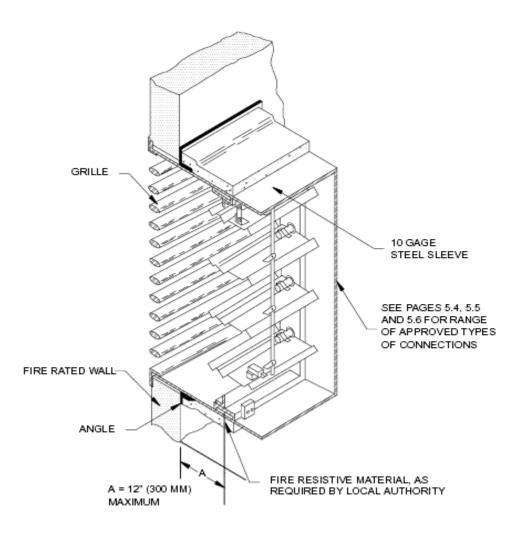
FIRE DAMPER OUT OF WALL
